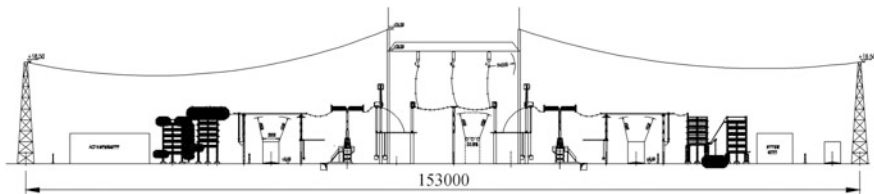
Typical profile of checkerboard-pattern layout (mm)
